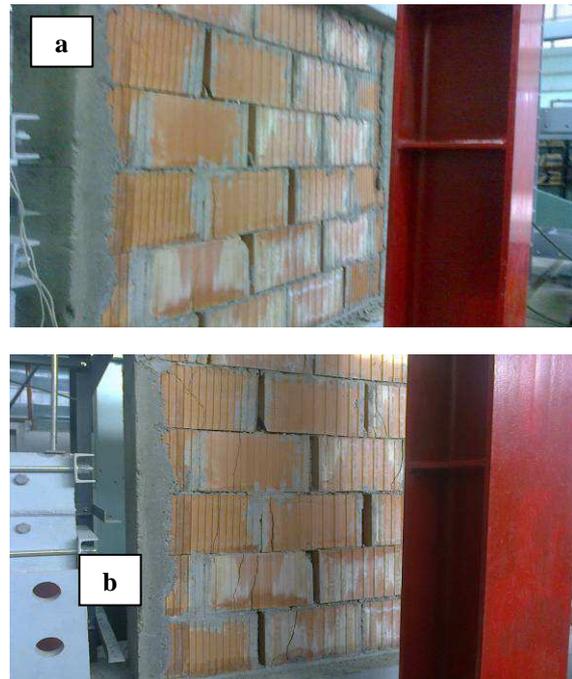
Failure mode for RM1 specimens (a. RM1, b. RM1-1)
